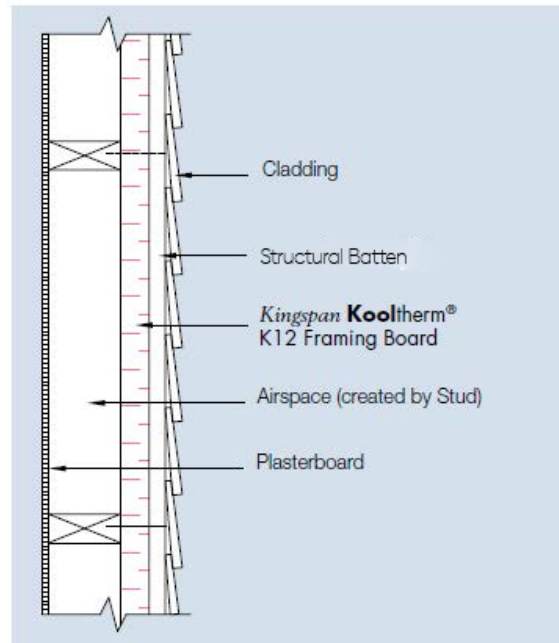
Timber framed wall with Kingspan Kooltherm® K12 Framing Board, counter battens and internal plasterboard lining
